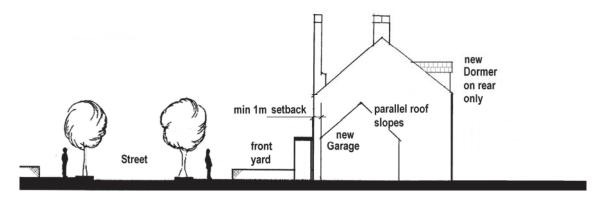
Side view – a new garage must be set back at least 600mm from the front façade of a dwelling. Roofs must be parallel with the slope of the existing roof and use the same roofing material. Any new dormers in roof spaces must be at the rear only.
